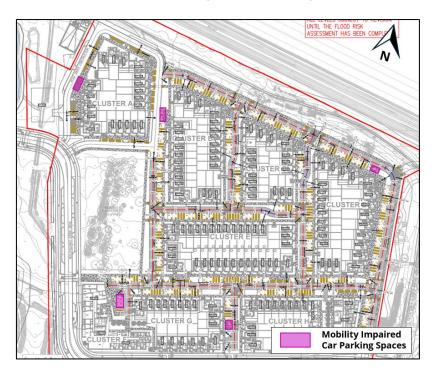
Site 4 Mobility Impaired Car Parking Spaces (North of Link Road)
